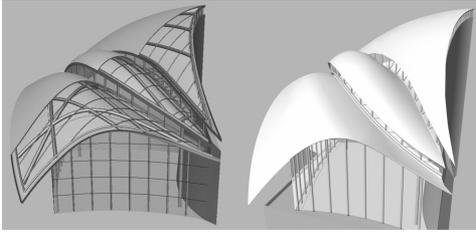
Two construction types: a steel structure of circular hollow sections (left) and the structural sandwich structure (right).
